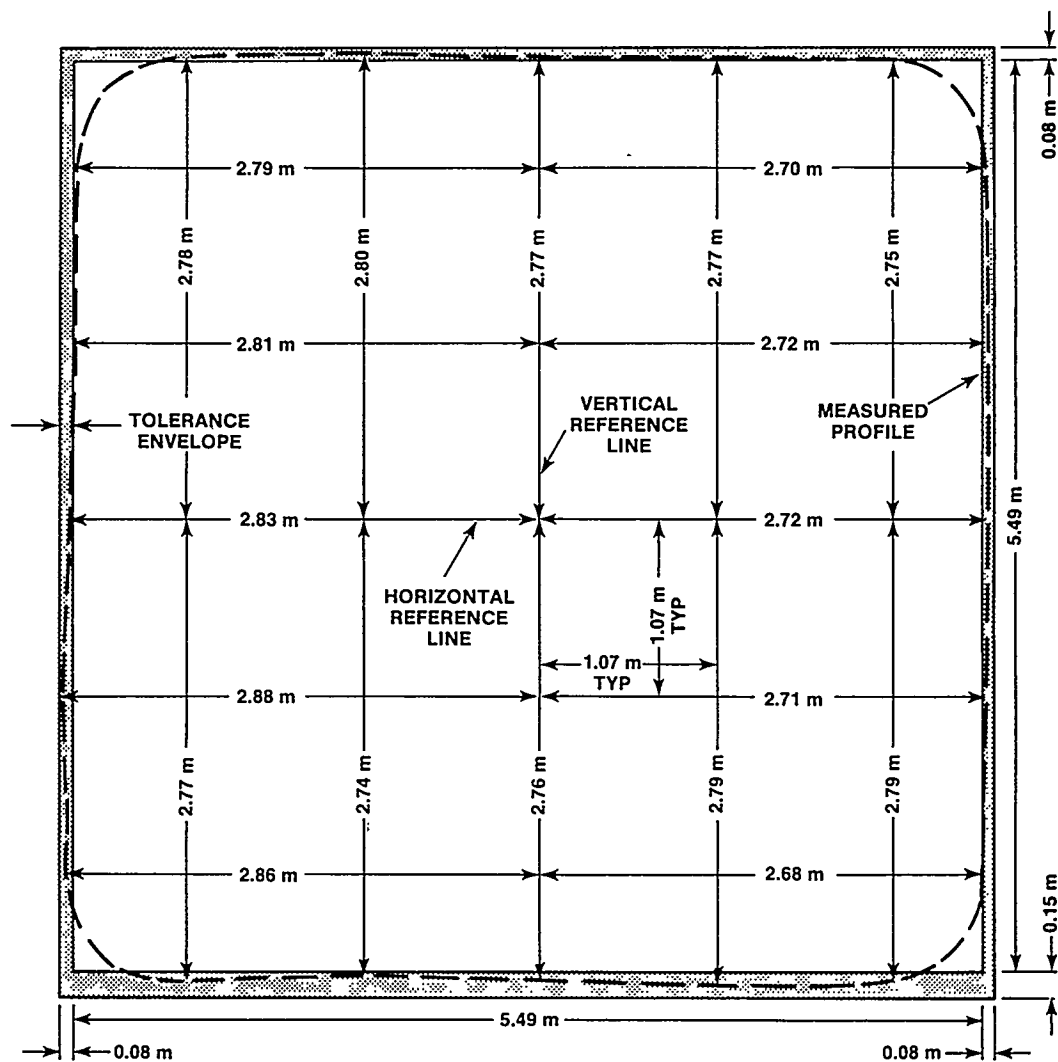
As-Built Cross Section of Station +15.2 m, Room A3
